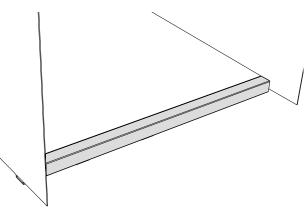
Reinforce the edge of the floor where the floor extension is to be installed with a suitable steel section.
